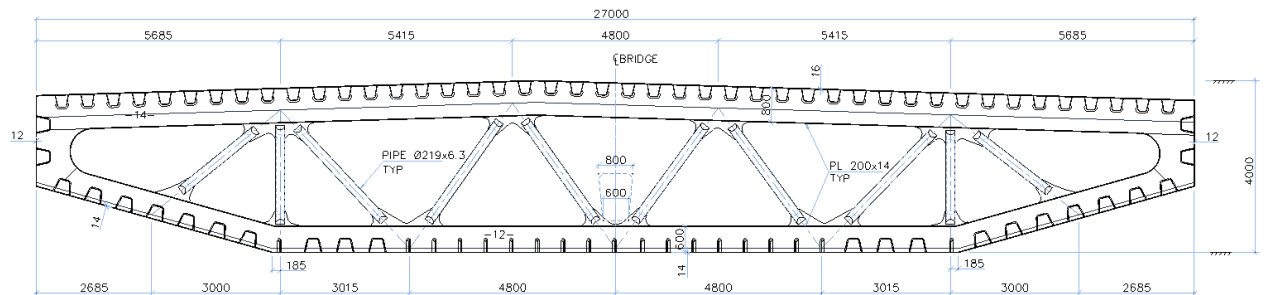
Typical transverse truss for axis 3 - 8, column width of 9600 mm
